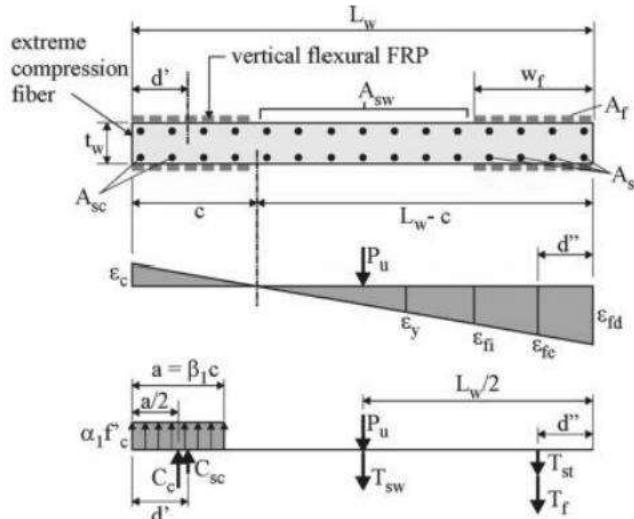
FRP reinforcement for flexural strengthening.
